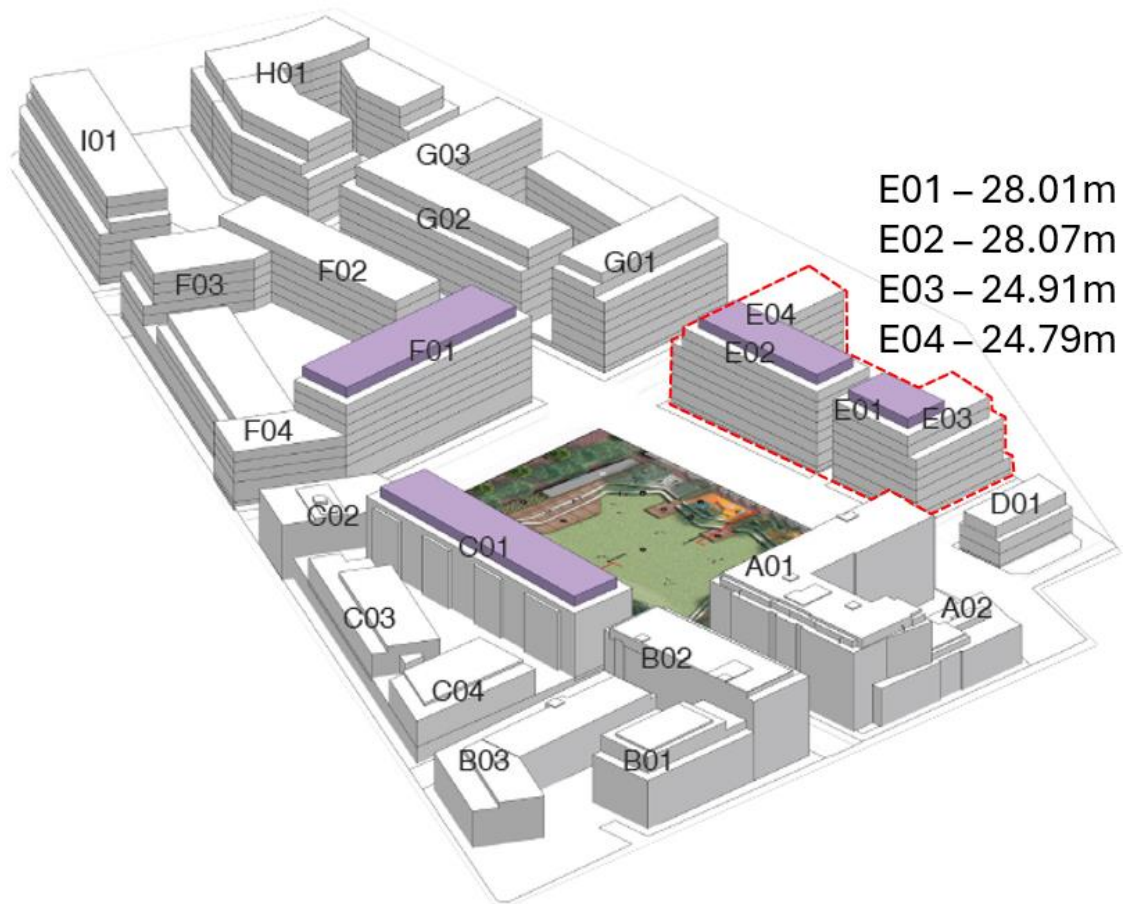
Approved axonometric concept plan indicating building height - D/2015/966/C
